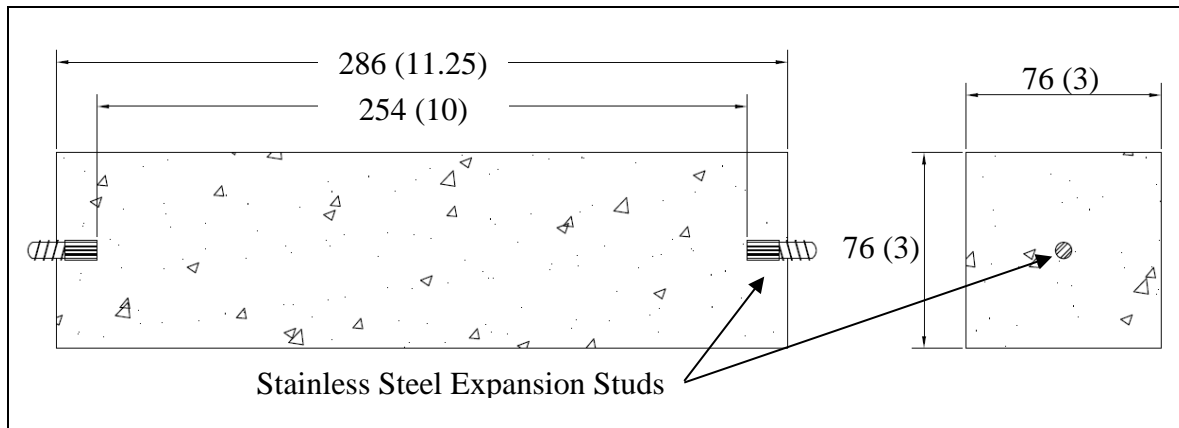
Concrete Prism Test Specimen Dimensions, mm (inches)
